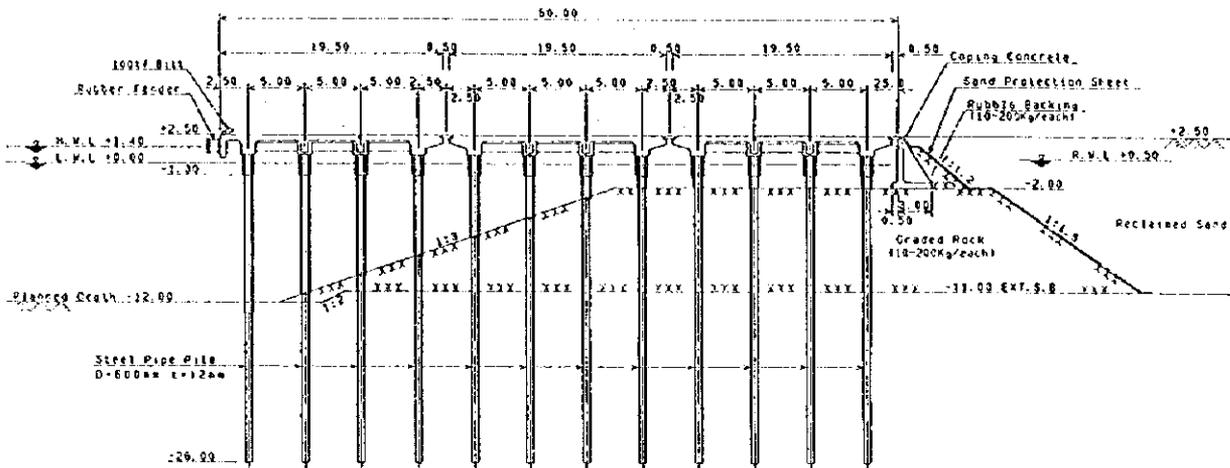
(1) Typical Cross Section of Quaywall E1 (Open Pier with Retaining Wall)
